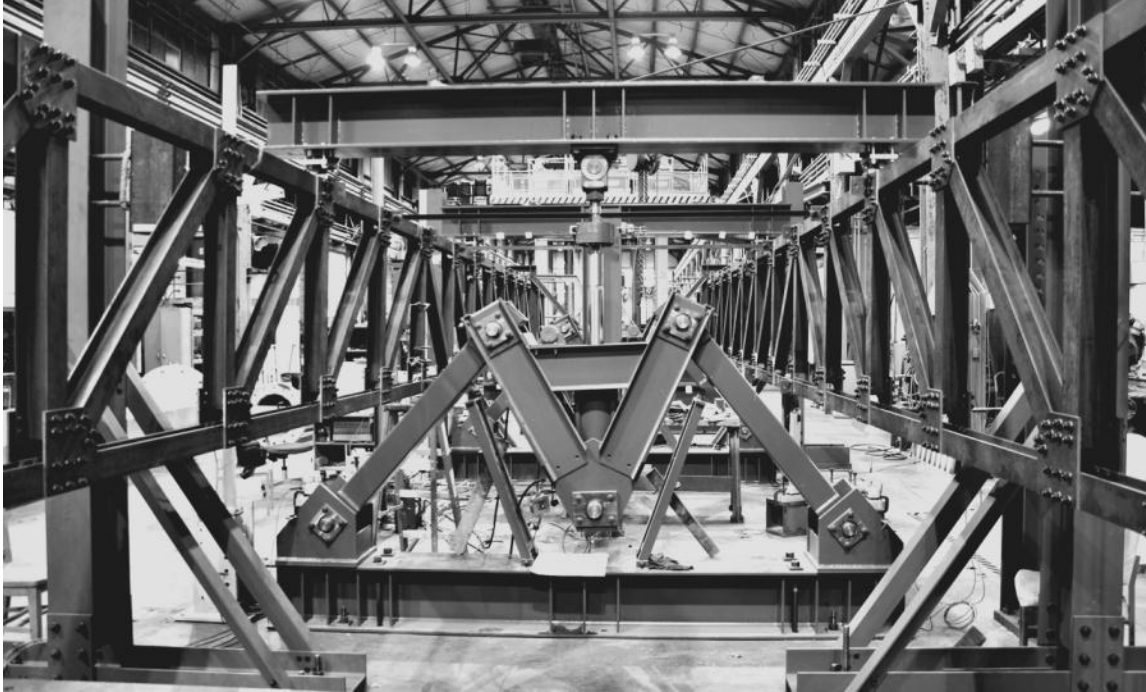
Test setup for load height effect test of 48-ft span truss
